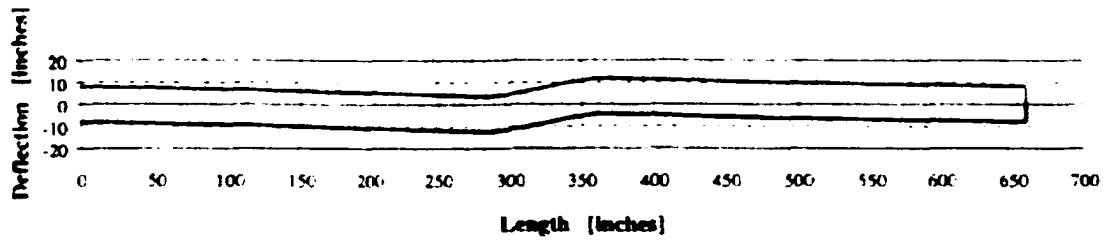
Deformed Shape of Top Flange of Test Girder D
